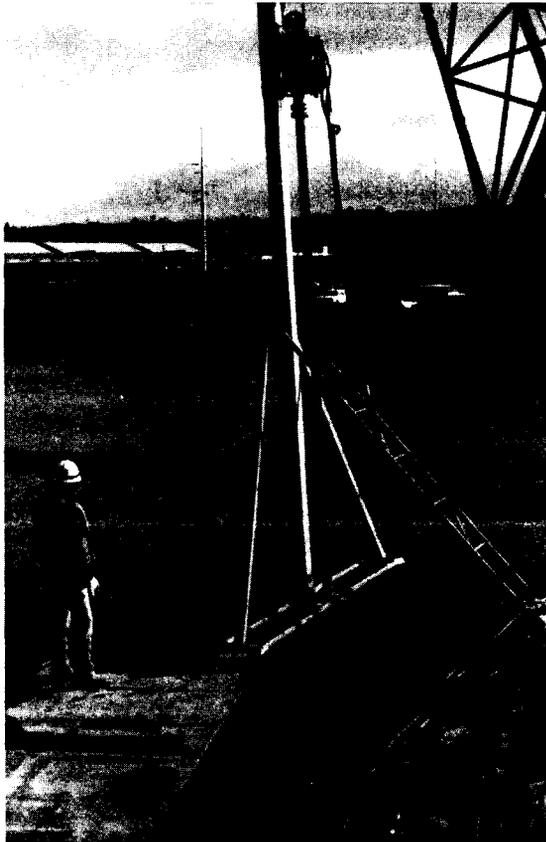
Typical Vibracore sampler being lowered to a subaqueous sampling site
